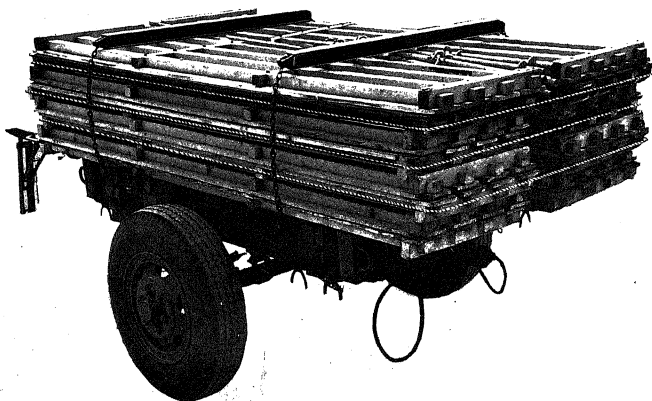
Trailer load No. 7—Footwalk load on 2 1/2-ton pole type trailer.
